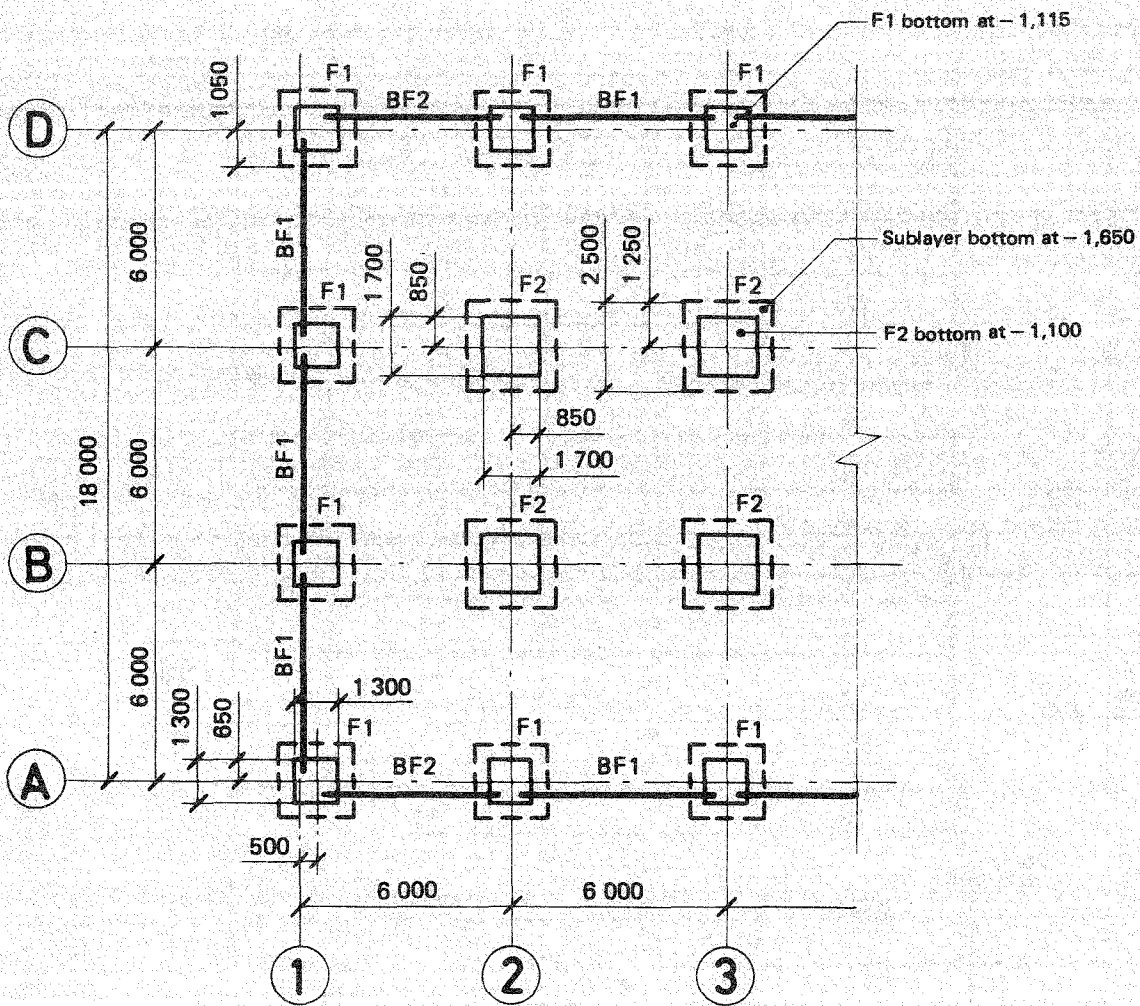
An example of a location diagram for foundations and foundation beams
